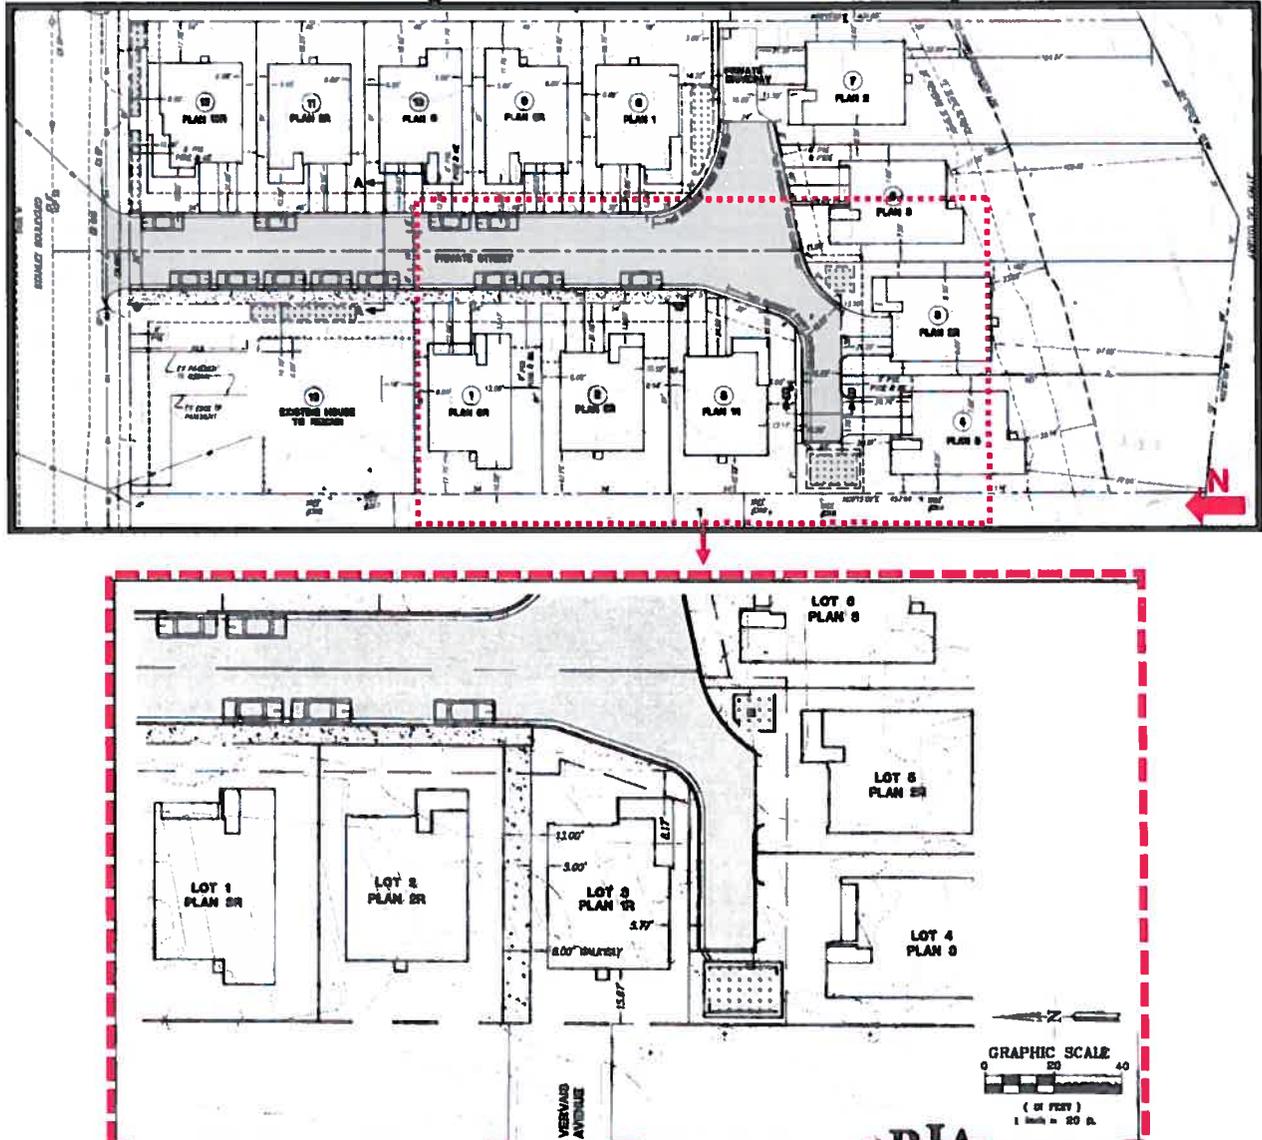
and Figure 3, shown on page 5 and 6, are, respectively, the 13-unit development plan (Option 1) and the proposed 14-unit development plan (Option 2).
